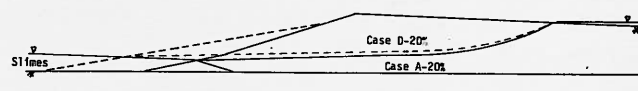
Effect of proposed cyclone tailing facing -- lower pool elevation at 10,774 feet.
